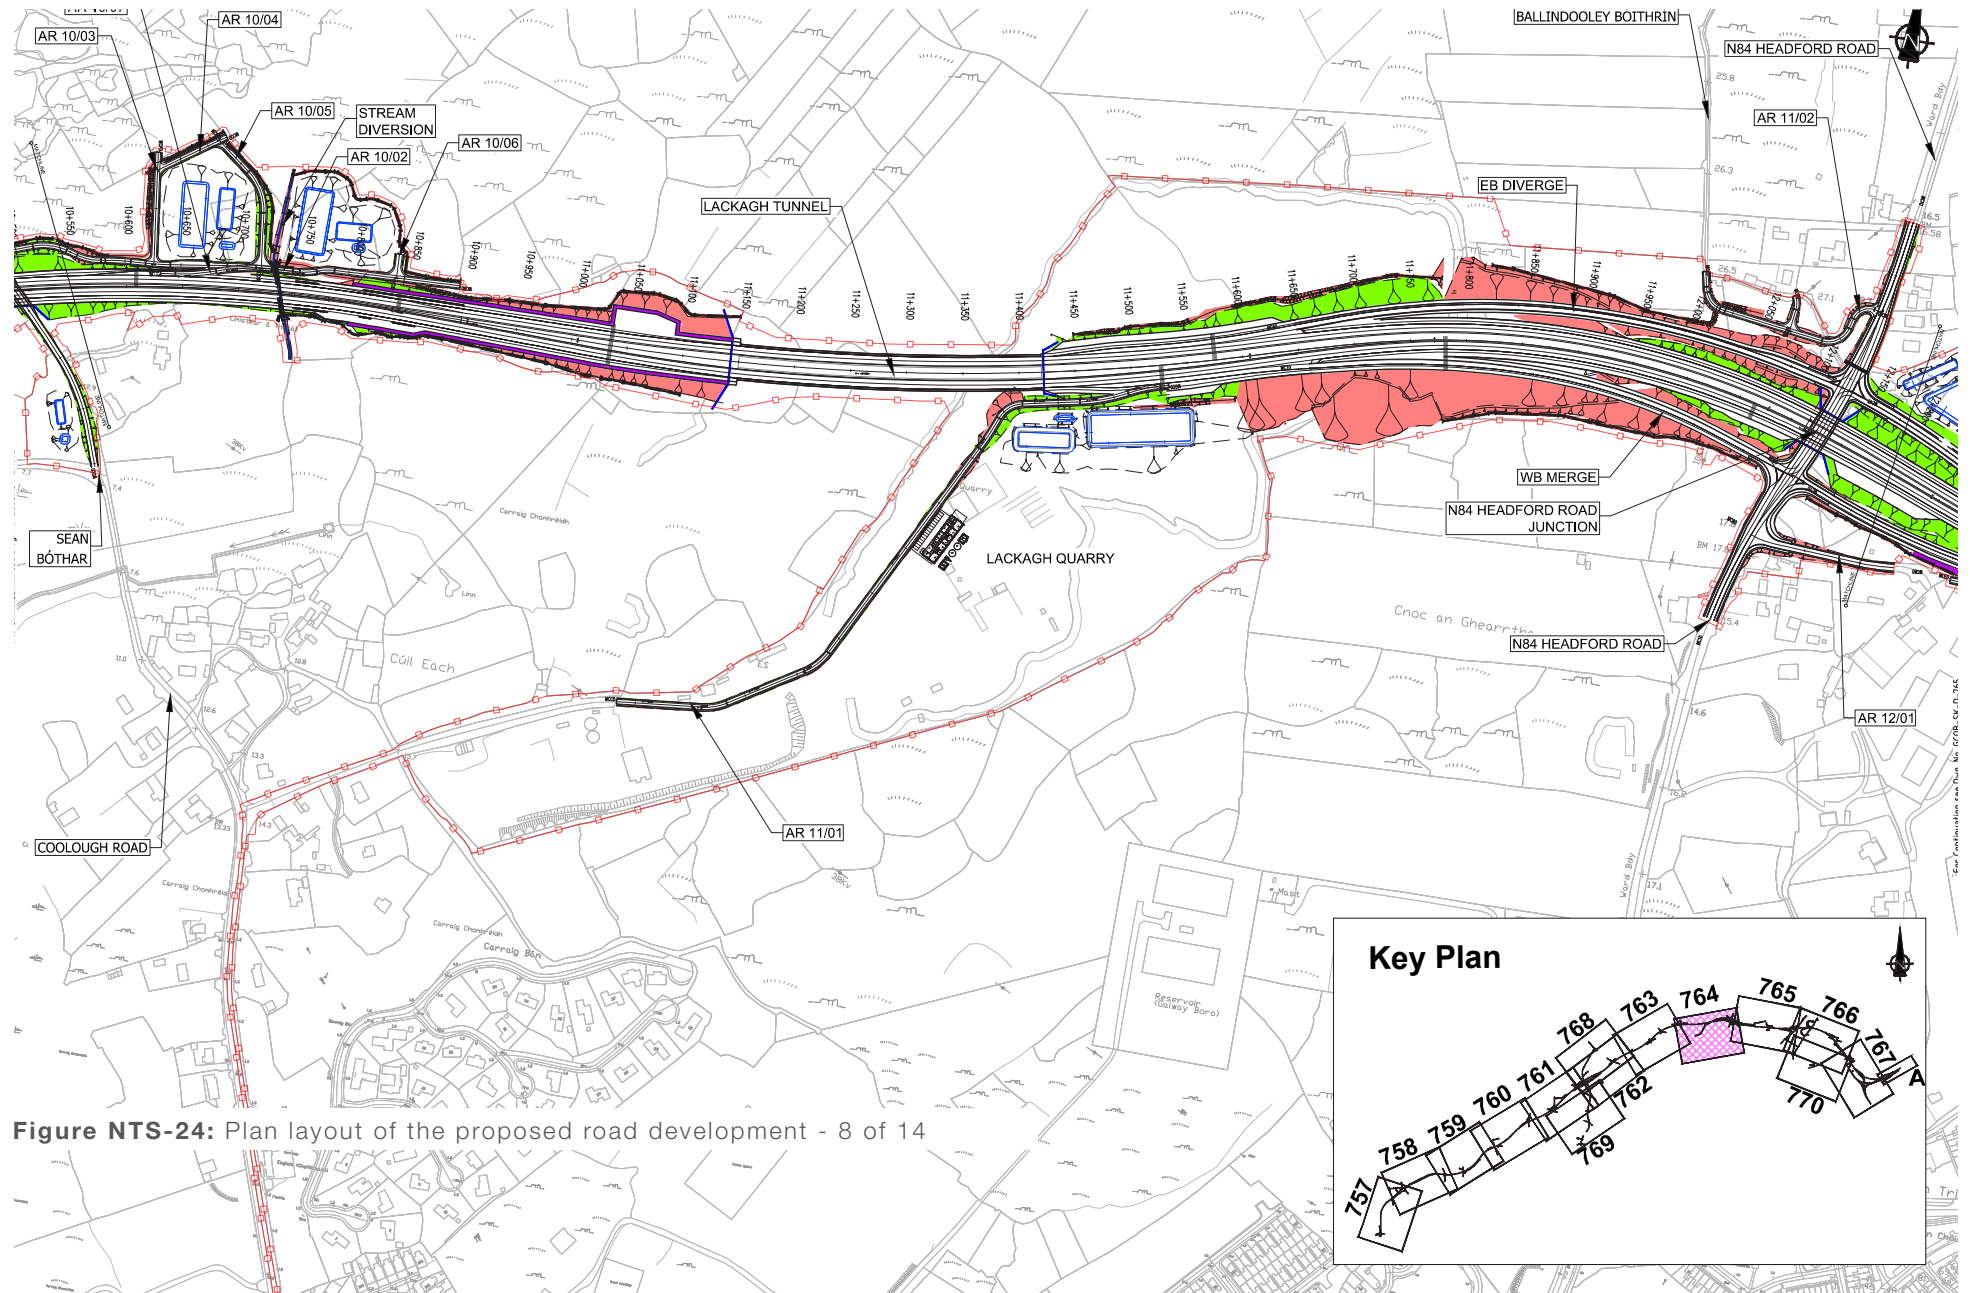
Plan layout of the proposed road development - 8 of 14
